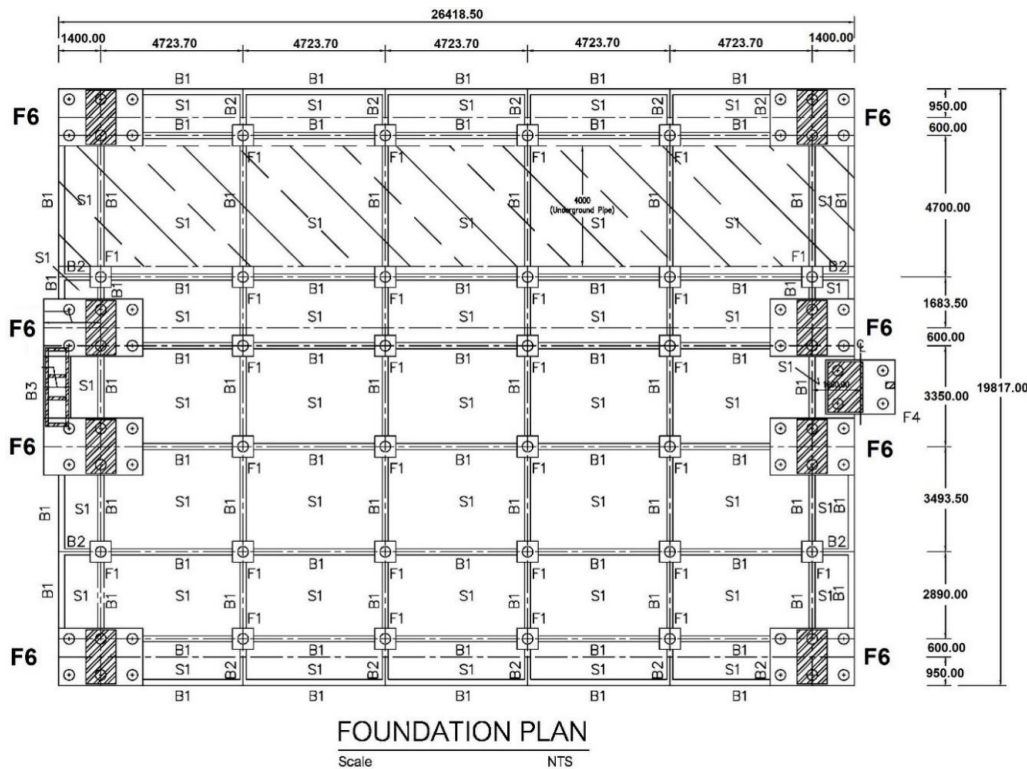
Ground floor framing plan and the layout of the foundations No. 6 (F6).
